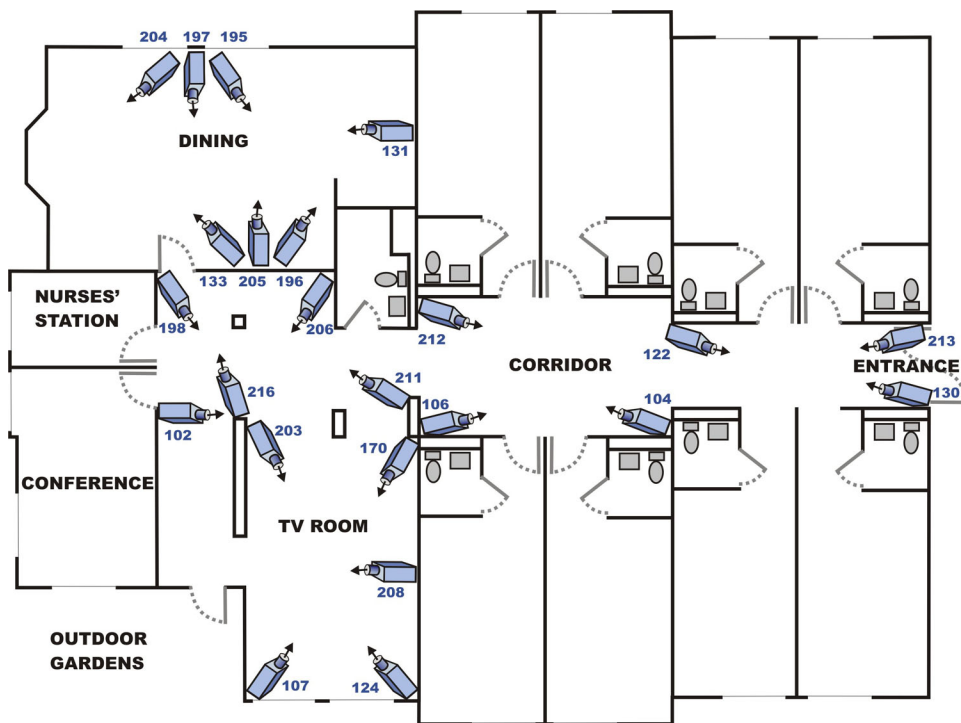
Floor plan of second CareMedia deployment showing camera placement.
